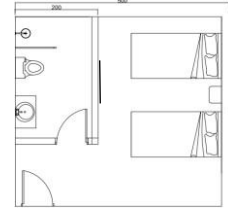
Sketch layout twin bed (Azkia, 2023)
